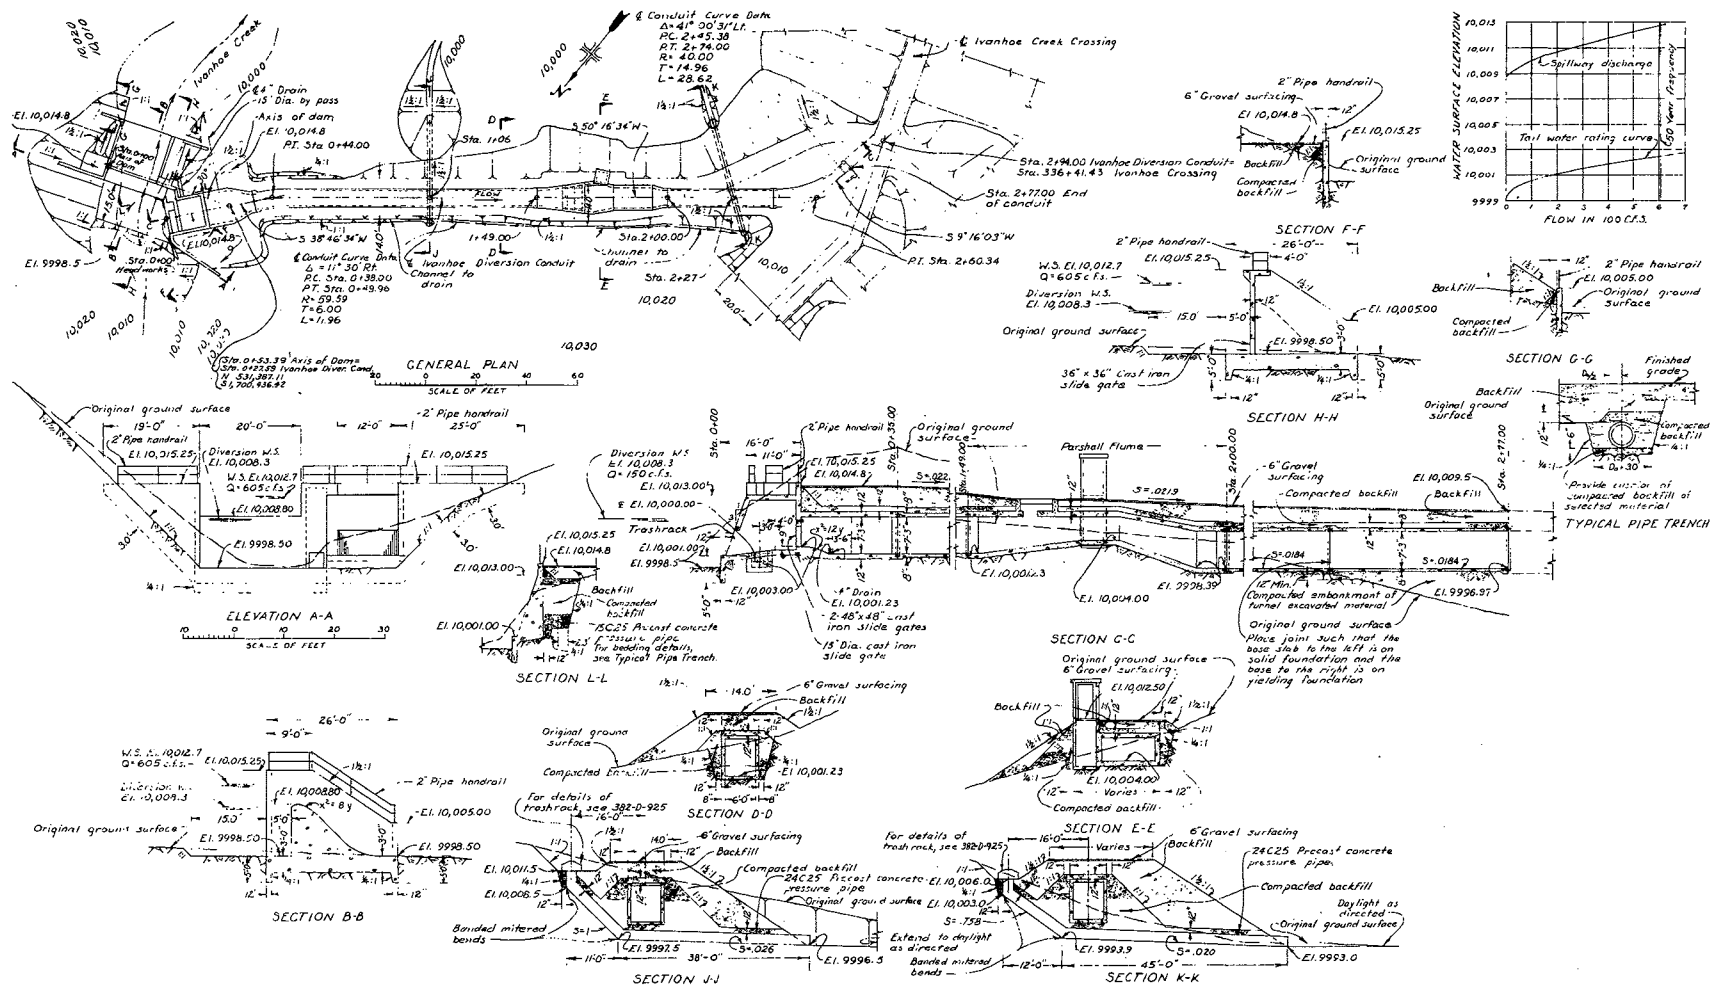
Ivanhoe Diversion Dam—North side collection system—General plan and sections. From Drawing No. 382-D-884
